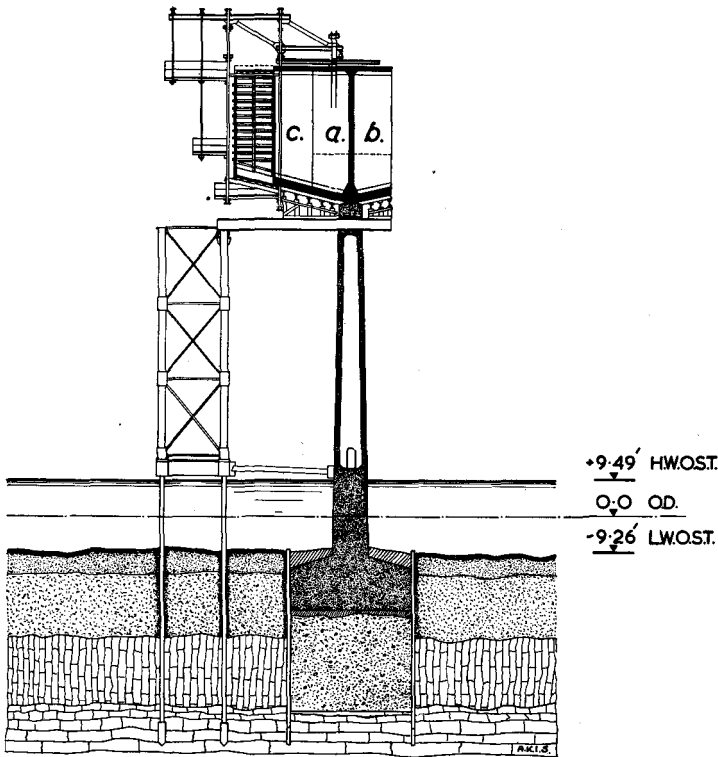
Initial Procedure for Constructing the Anchor and Cantilever Spans.
